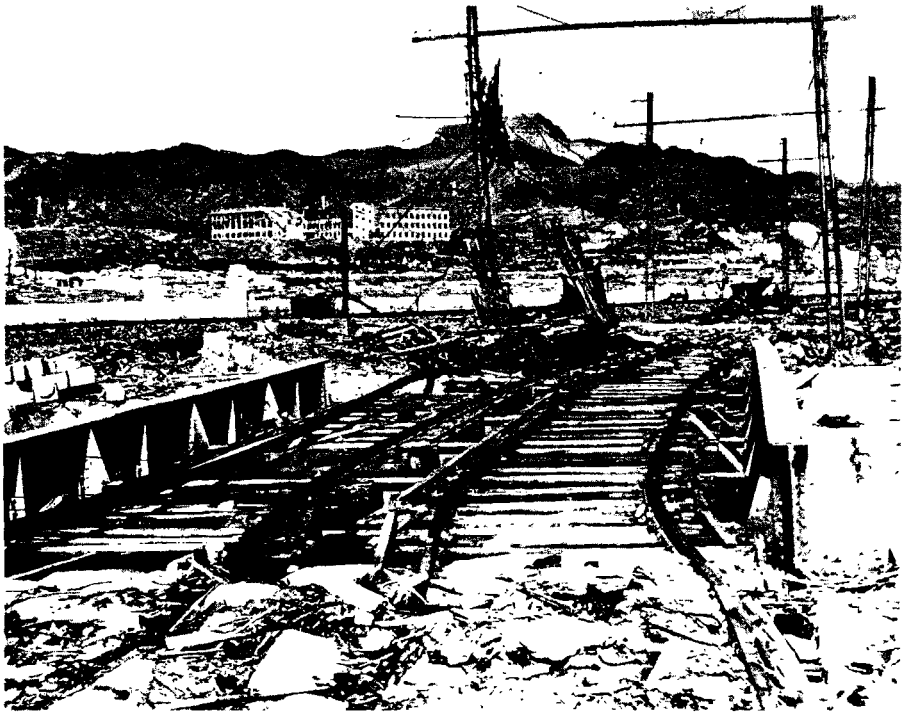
A steel-plate girder, double-track railway bridge (0.16 mile from ground zero at Nagasaki). The plate girders were moved about 3 feet by the blast; the railroad track was bent out of shape and trolley cars were demolished, but the poles were left standing.
